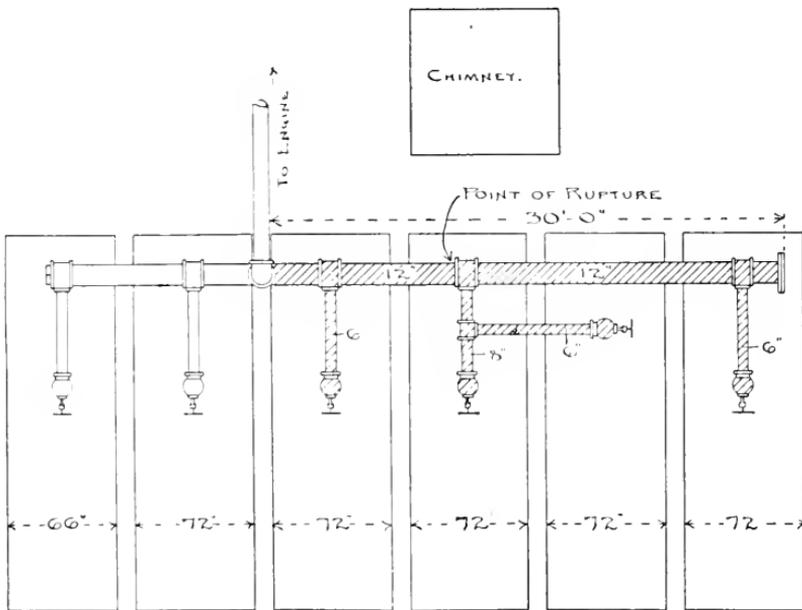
PLAN VIEW OF BOILER PLANT.
